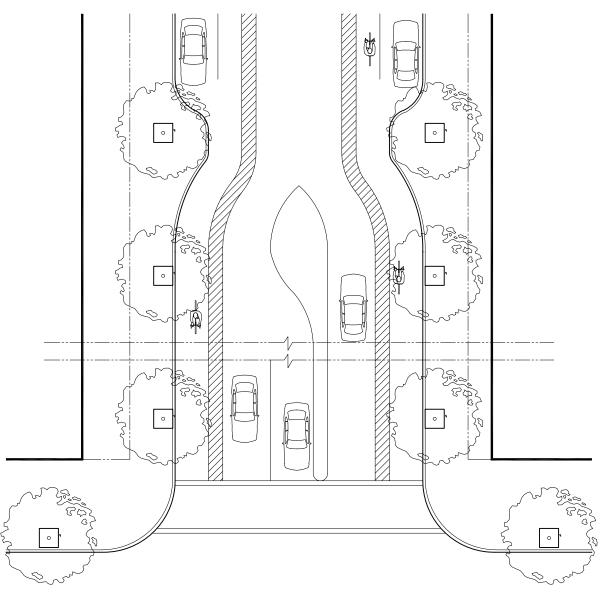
STREET TYPE 2.1: NEIGHBORHOOD STREET A - TYPICAL INTERSECTION (PLAN VIEW)
